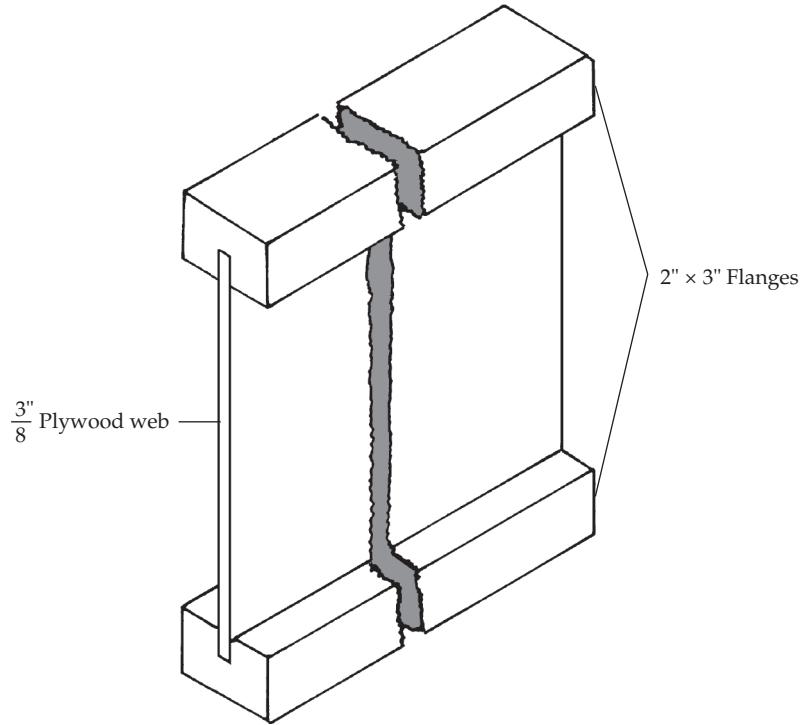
An example of a plywood web beam that can be used as a floor/ceiling joist.
